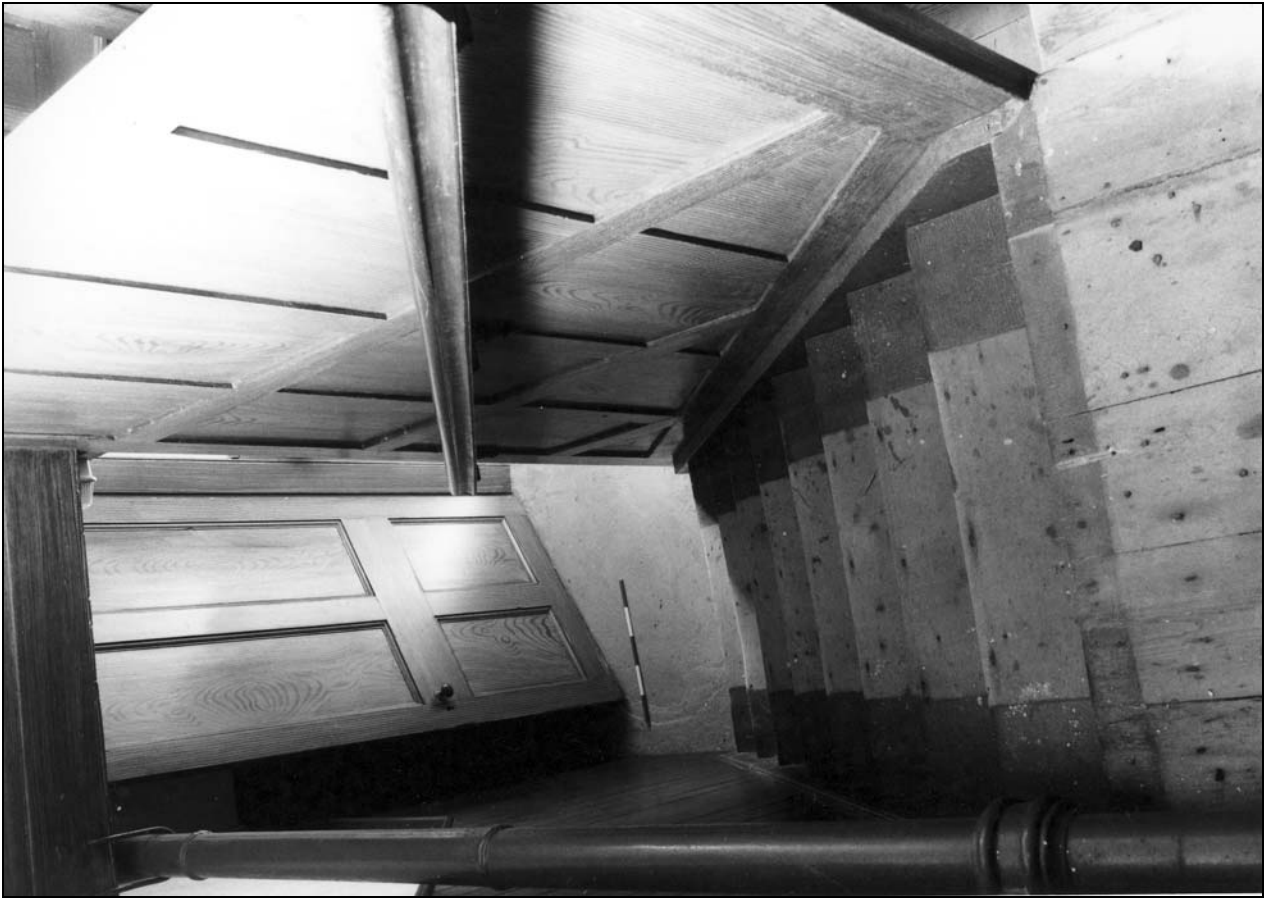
View down east stairs from gallery, looking south (film 3, frame 12)
